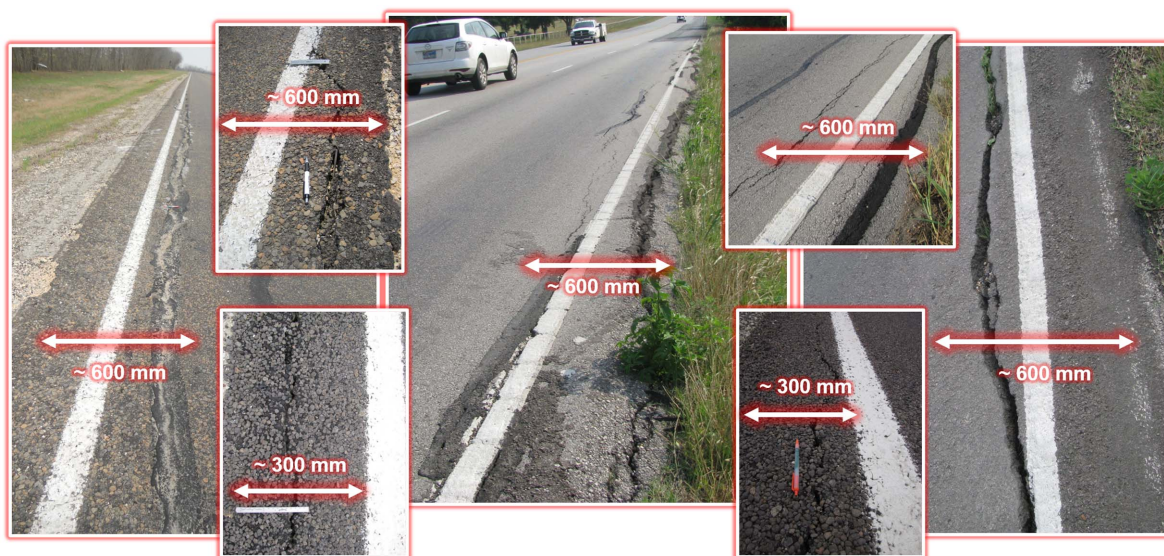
Locations of environmental longitudinal cracks in central Texas roadways without geosynthetic stabilization founded over expansive clay subgrades.
